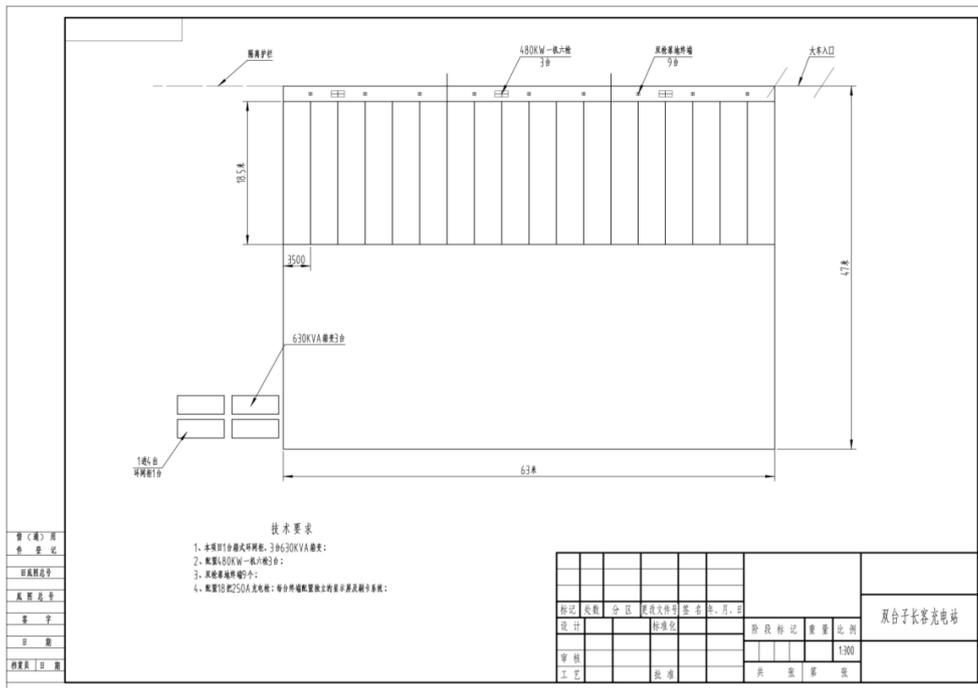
Layout of long-distance passenger charging piles in Shuangtaizi, Panjin
